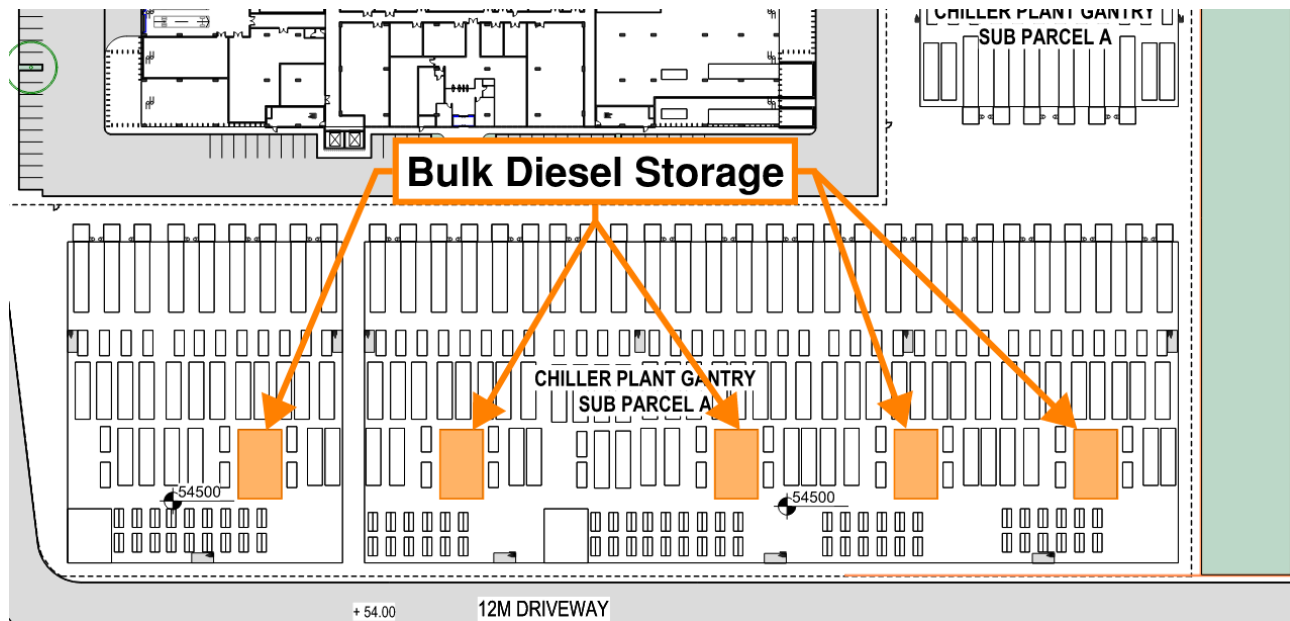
Location of Bulk Storage tanks – Ground Floor Chiller Gantry – Typical Layout of All Buildings
